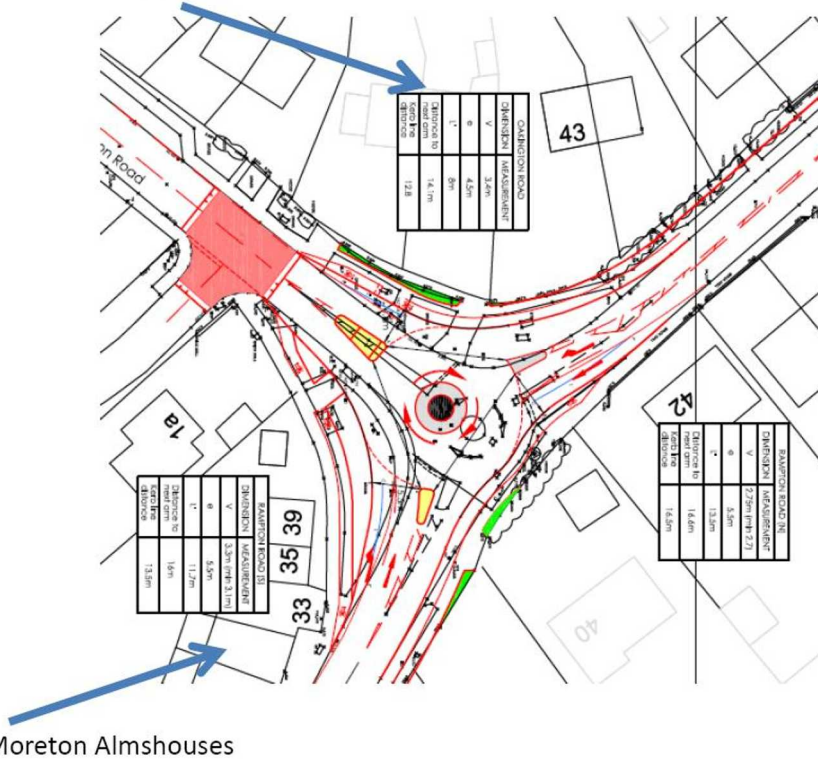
Proposed “improvement” to Oakington Road / Rampton Road roundabout
